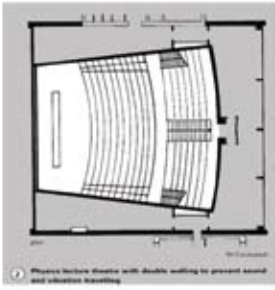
Plan layout of trapezoidal lecture theatre with double walling to prevent sound and vibration travelling.
